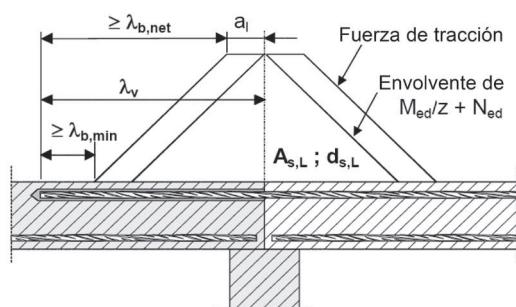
Reinforcement anchor to cover the action line of the tensile force.
